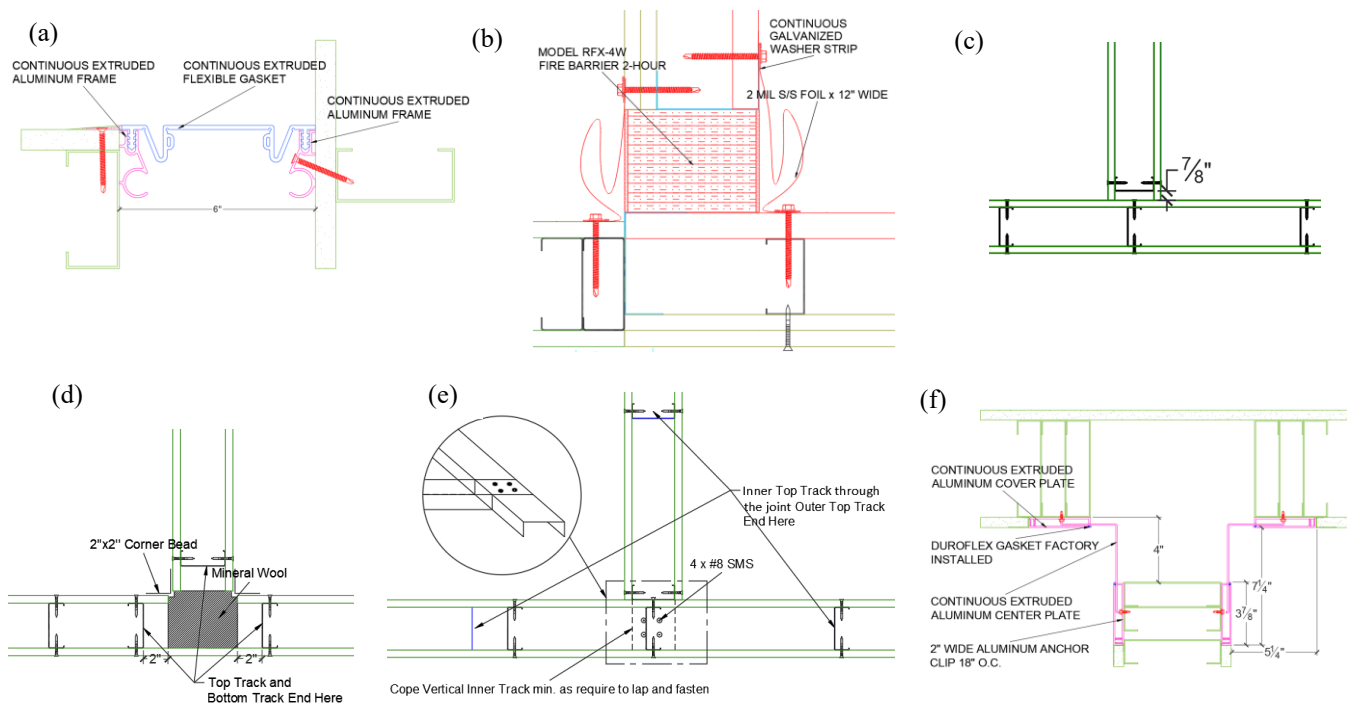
Intersecting wall details: a) FWFC-600 expansion joint, b) fire barrier expansion joint, c) standard corner, d) corner gap, e) flexible corner, and f) AFWC-400 expansion joint.
